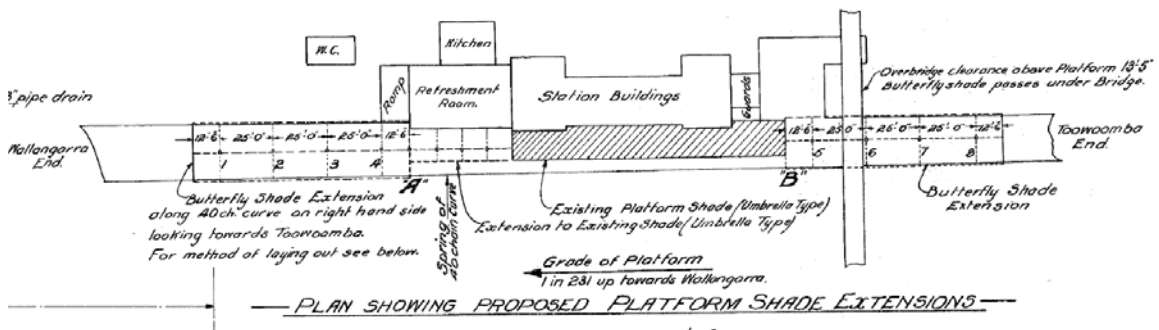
Plan of new platform awnings to refreshment room and to the north and south of the station, leaving existing curved roof awning in the centre. Source QLD Rail archive drawing no. L02377.
